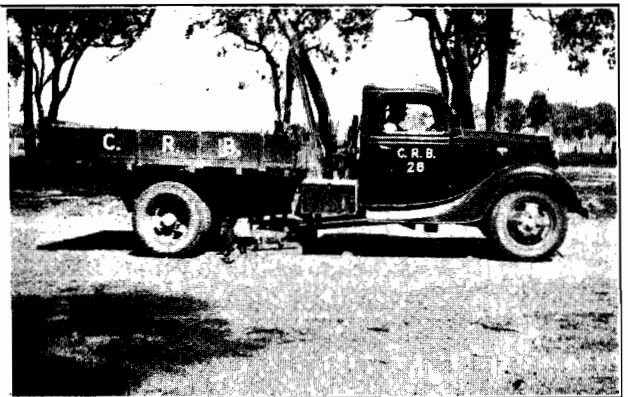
General Arrangement of Multi-blade Maintainer.
